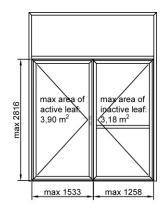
Maximum dimensions of technical doors and windows – Ei30, El60 [mm]
